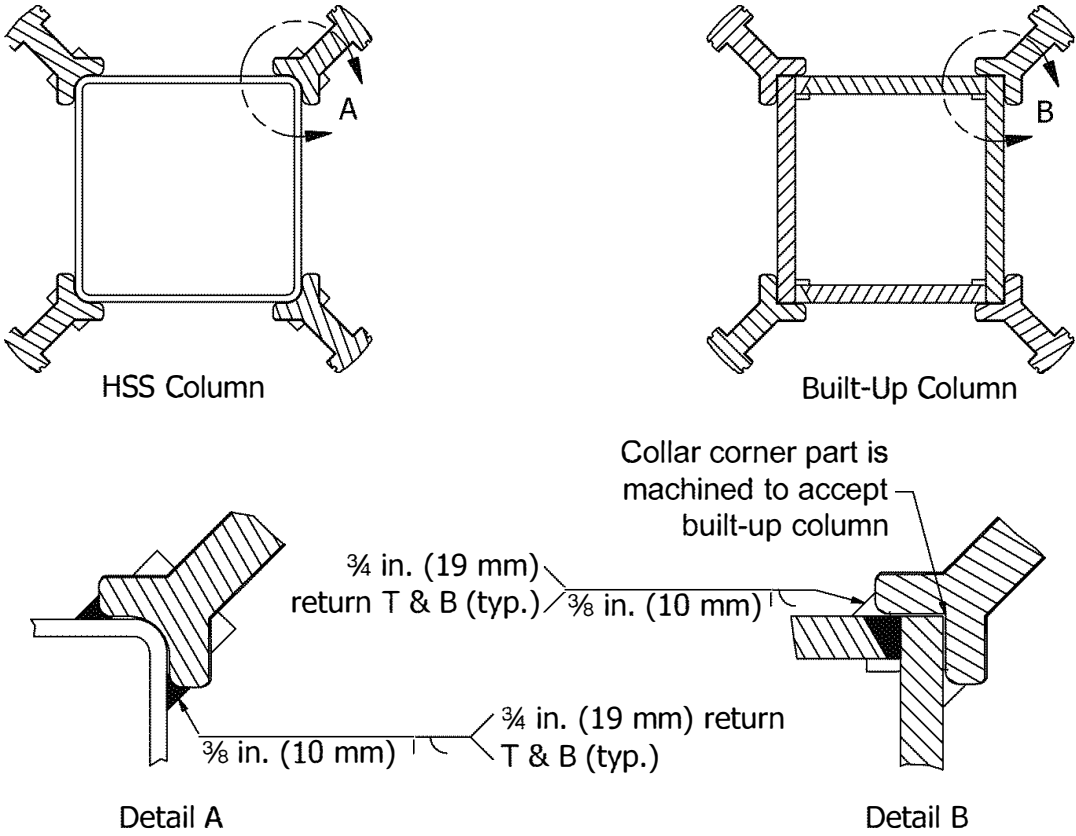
Collar-corner-assembly-to-column weld, plan view.
